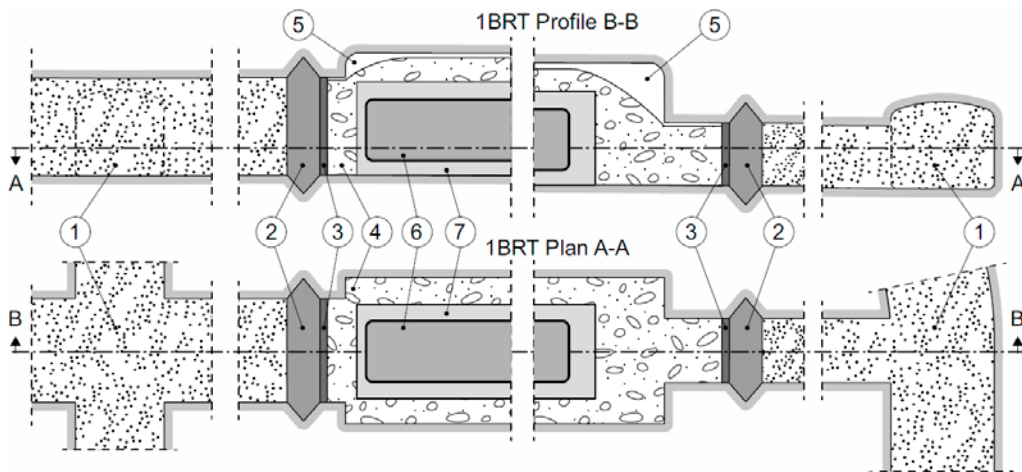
Schematic profiles of 1BRT after closure. Key to numbering: 1) bentonite 2) concrete plug 3) supporting wall and mould for casting 4) macadam 5) open gap between macadam and tunnel roof 6) reactor pressure vessel filled with concrete 7) concrete embedment. Reproduced from SKB (2014d, Figure 10-3).
